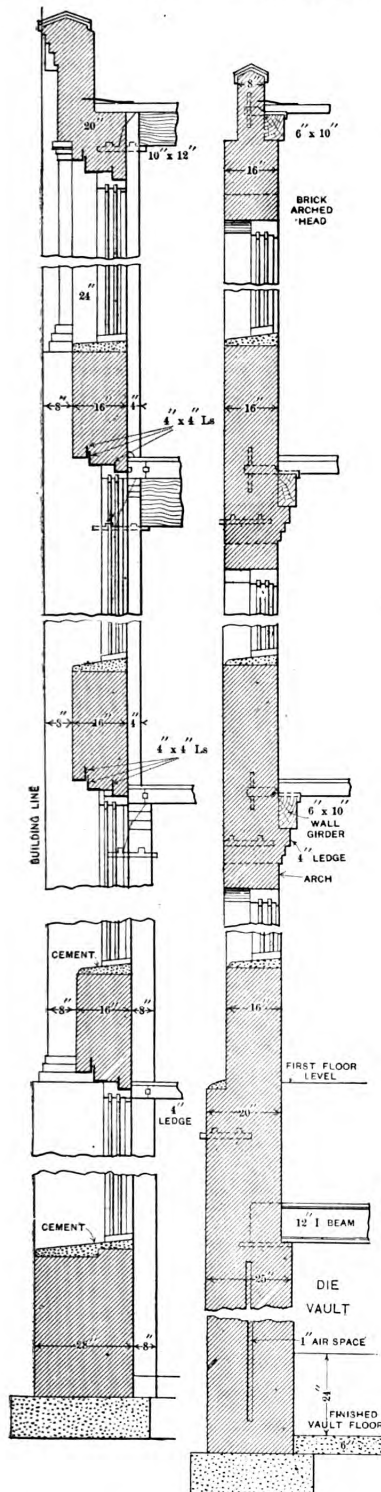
Section through Front Wall. Fig. 5.—Section through North Wall.
